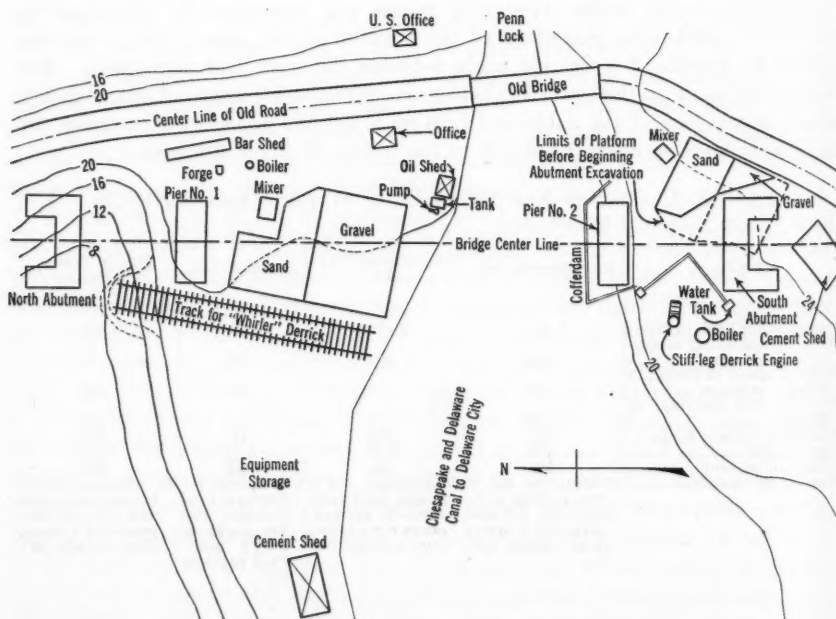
PLANT LAYOUT OF SUBSTRUCTURE, ST. GEORGES BRIDGE.
